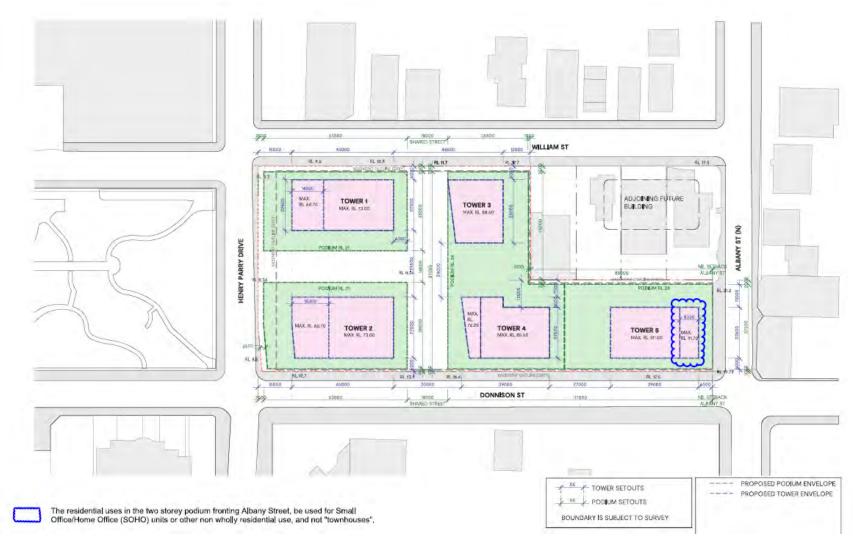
Plan view of approved development layout (Source: Buchan 2022)
